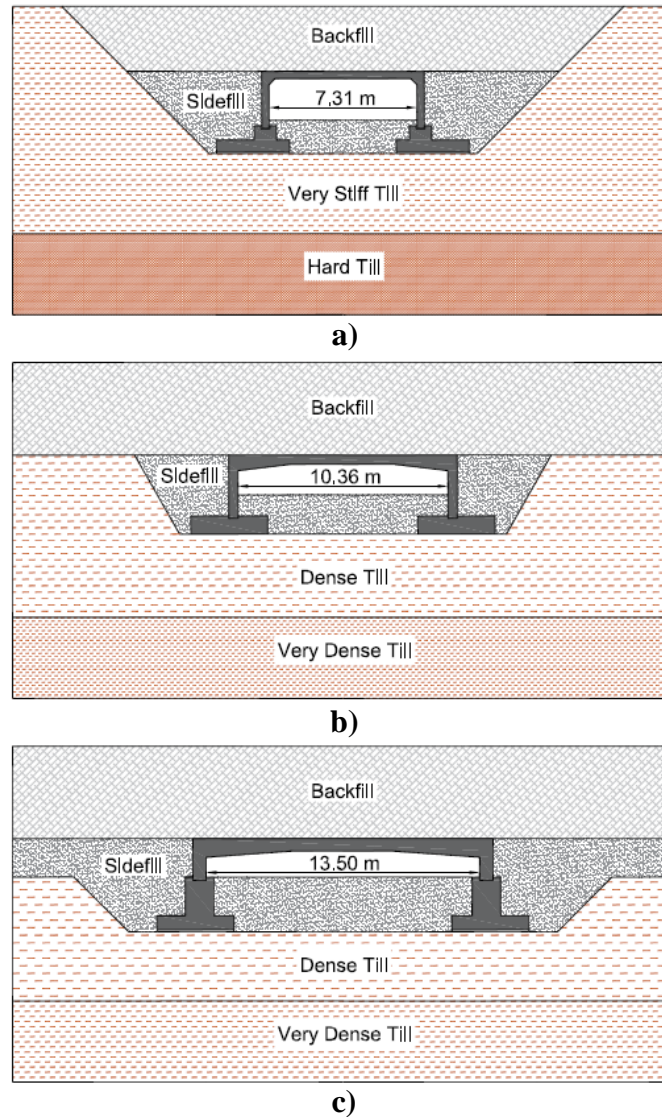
Geometry and installation method of the instrumented culverts: a) Remembrance culvert; b) Pickering culvert; and c) Oshawa culvert.
